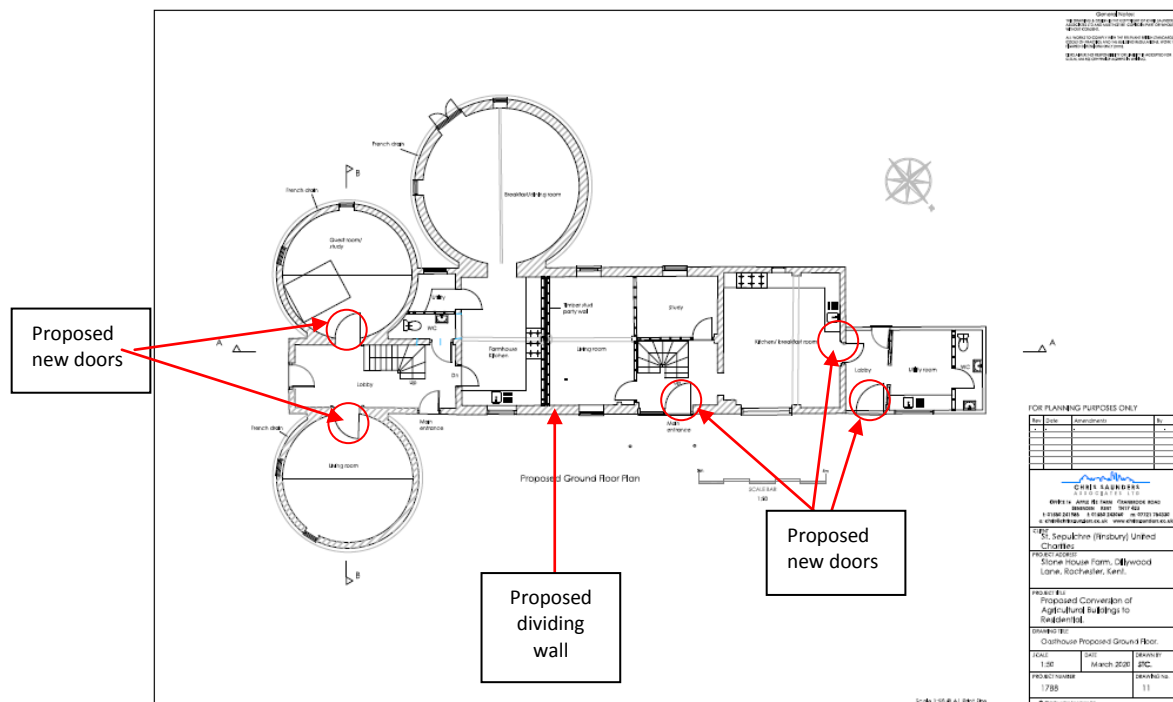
Proposed ground floor plan ©Chris Saunders Associates Ltd. drawing number: 1788/11.
